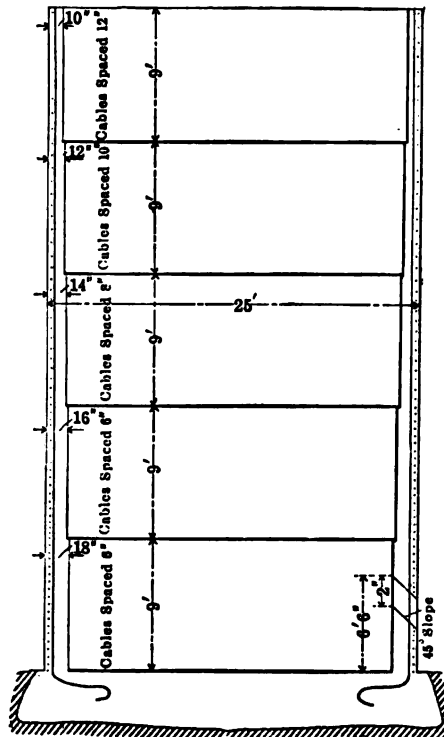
CONCRETE STORAGE BIN, MINERVILLE, N. Y.
